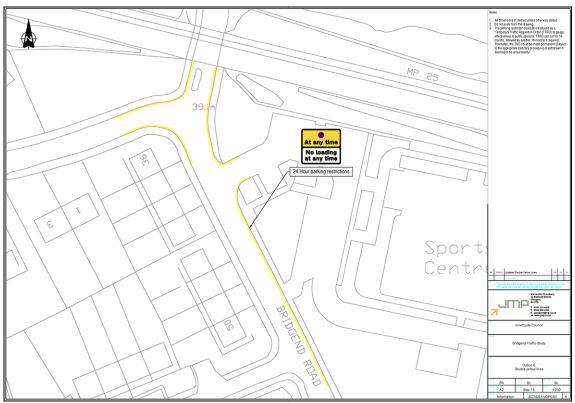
Option E, Provision of TRO on East Side of Bridgend Road and at Bridgend Road/Castle Road Junction
